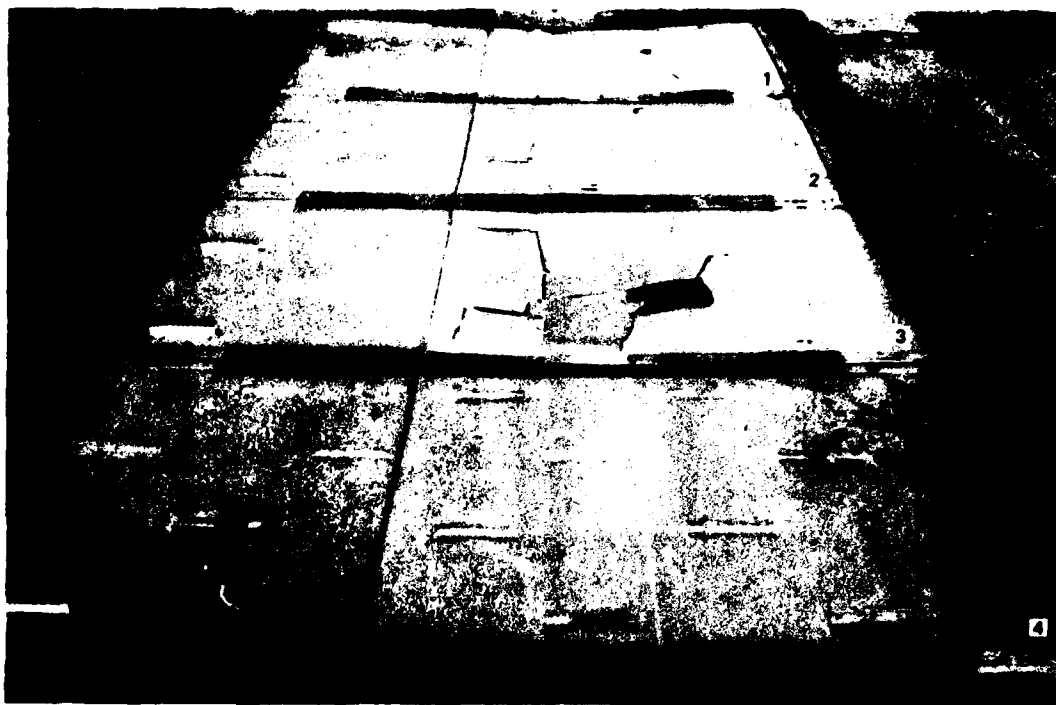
General view of item 2 at failure after 1920 passes (200 tank and 1720 truck passes)
